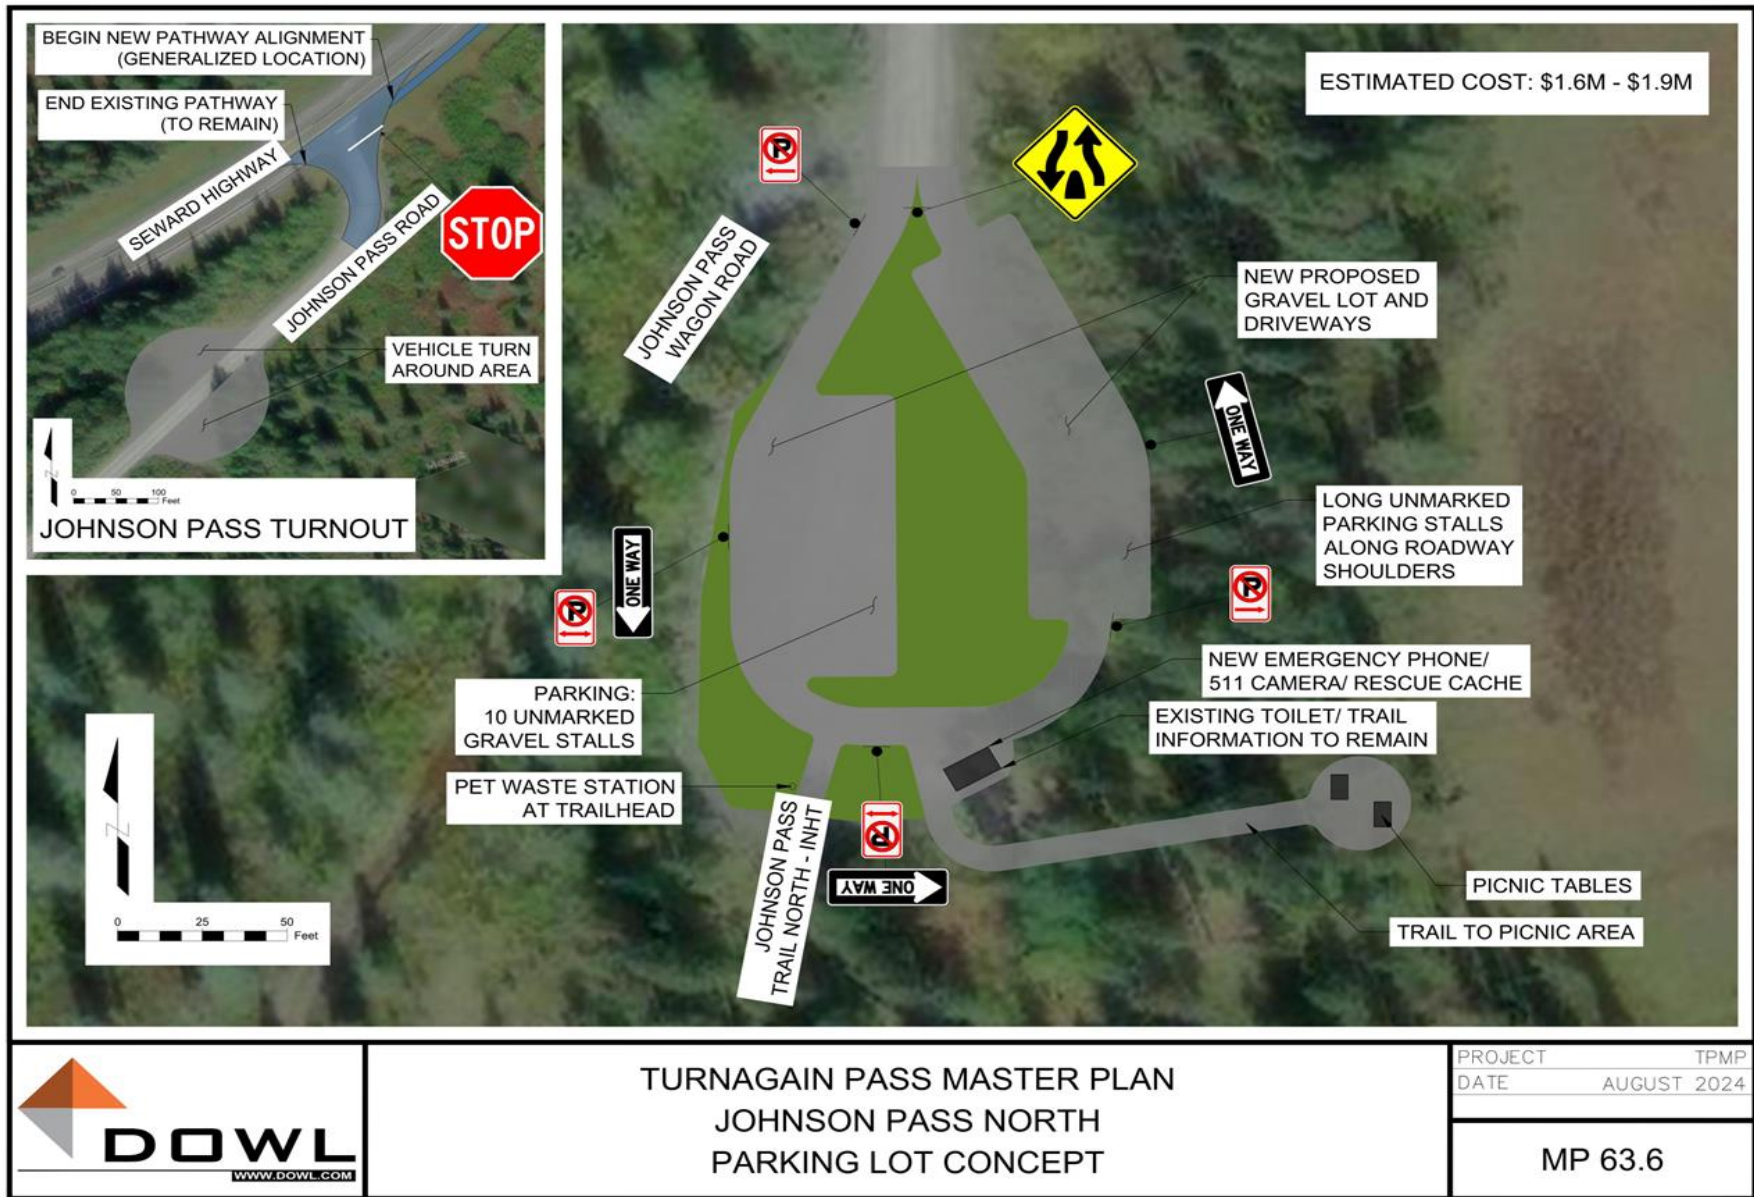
Johnson Pass Trailhead Access and Parking Lot Improvements, Conceptual Design
